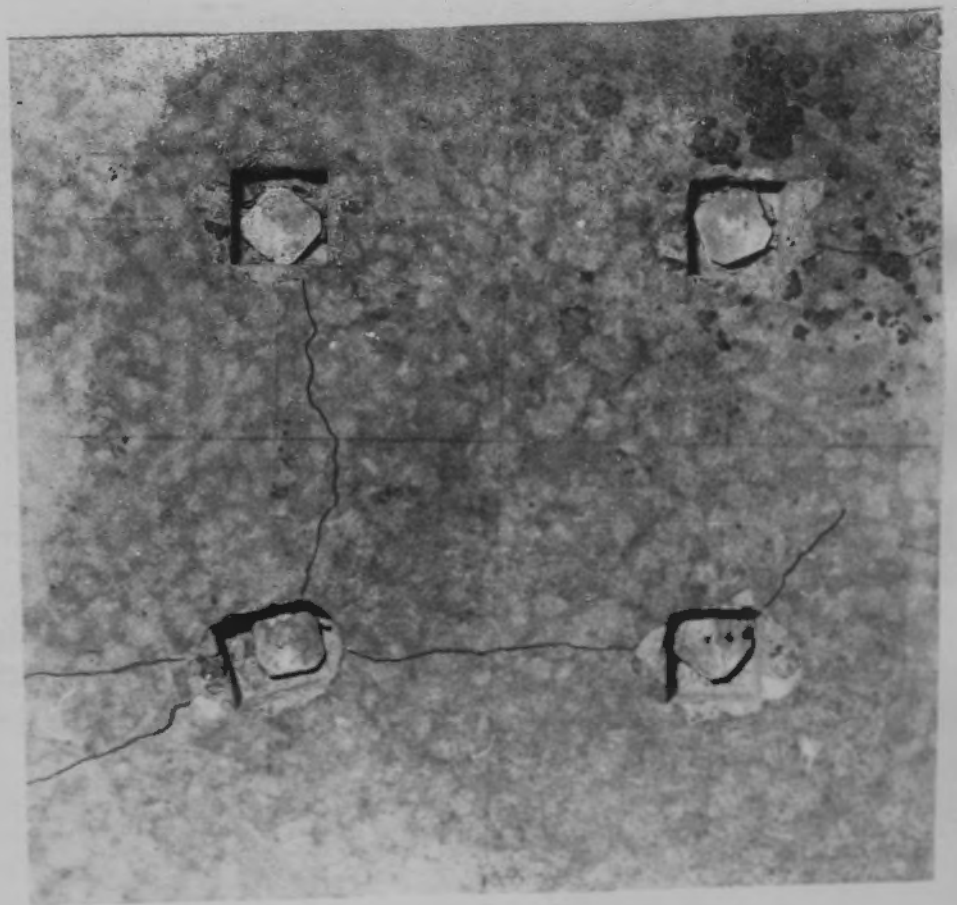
b. Bottom view of the pilot specimen after failure.
